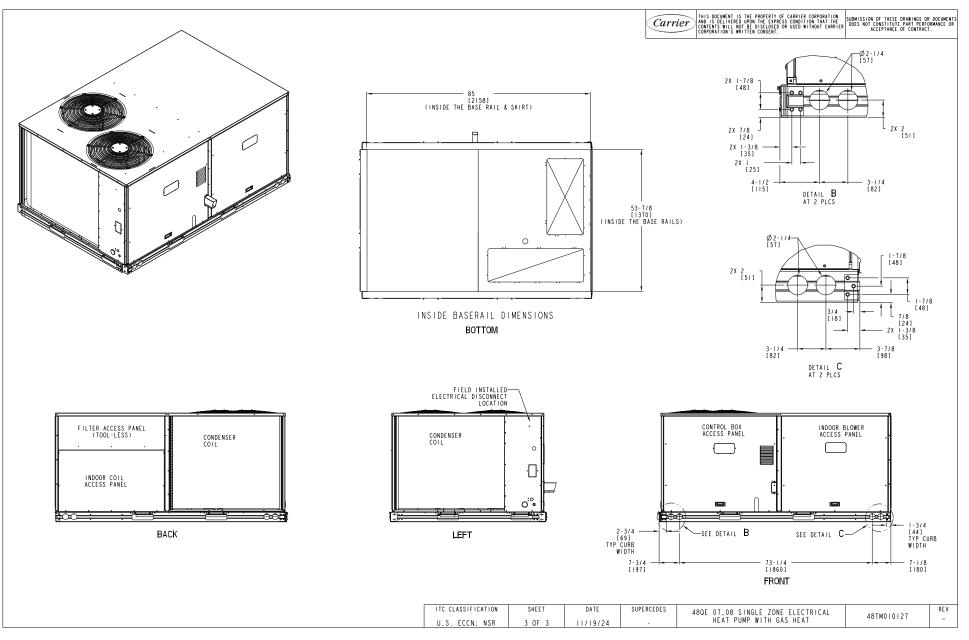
48QE 07-08 Unit Dimensional Drawing (cont)
